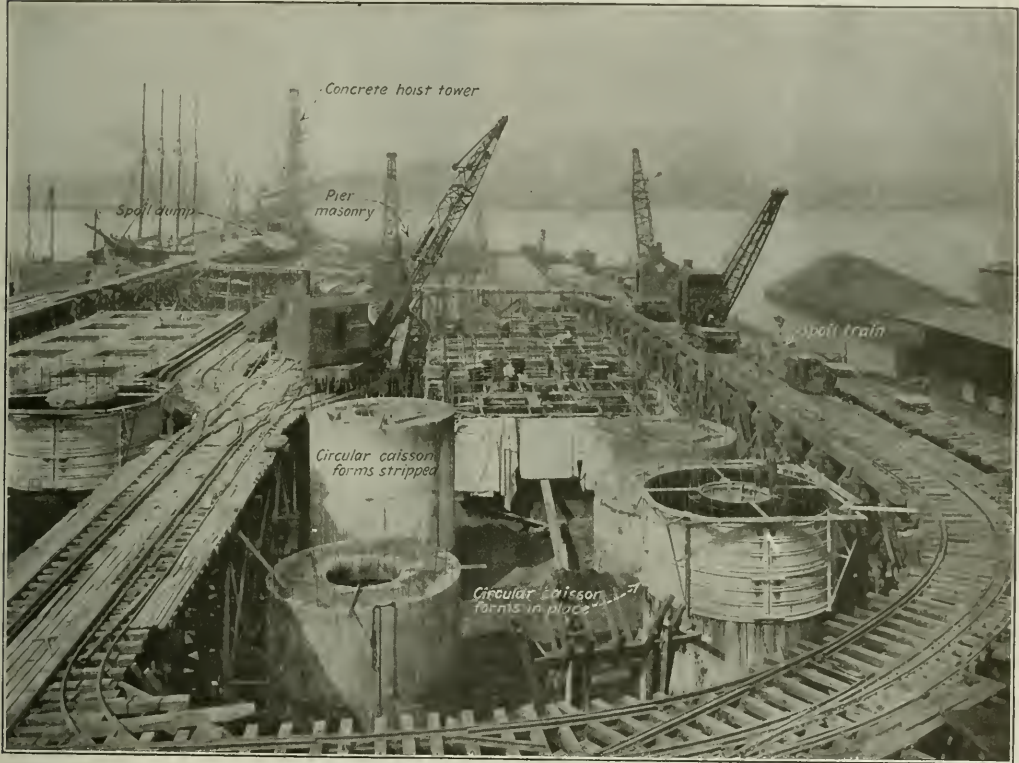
CAMDEN ANCHORAGE LOOKING WEST
